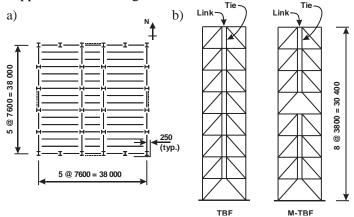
Building structure studied: a) Floor plan; b) Elevation of the 8-storey TBF and M-TBF frames.
